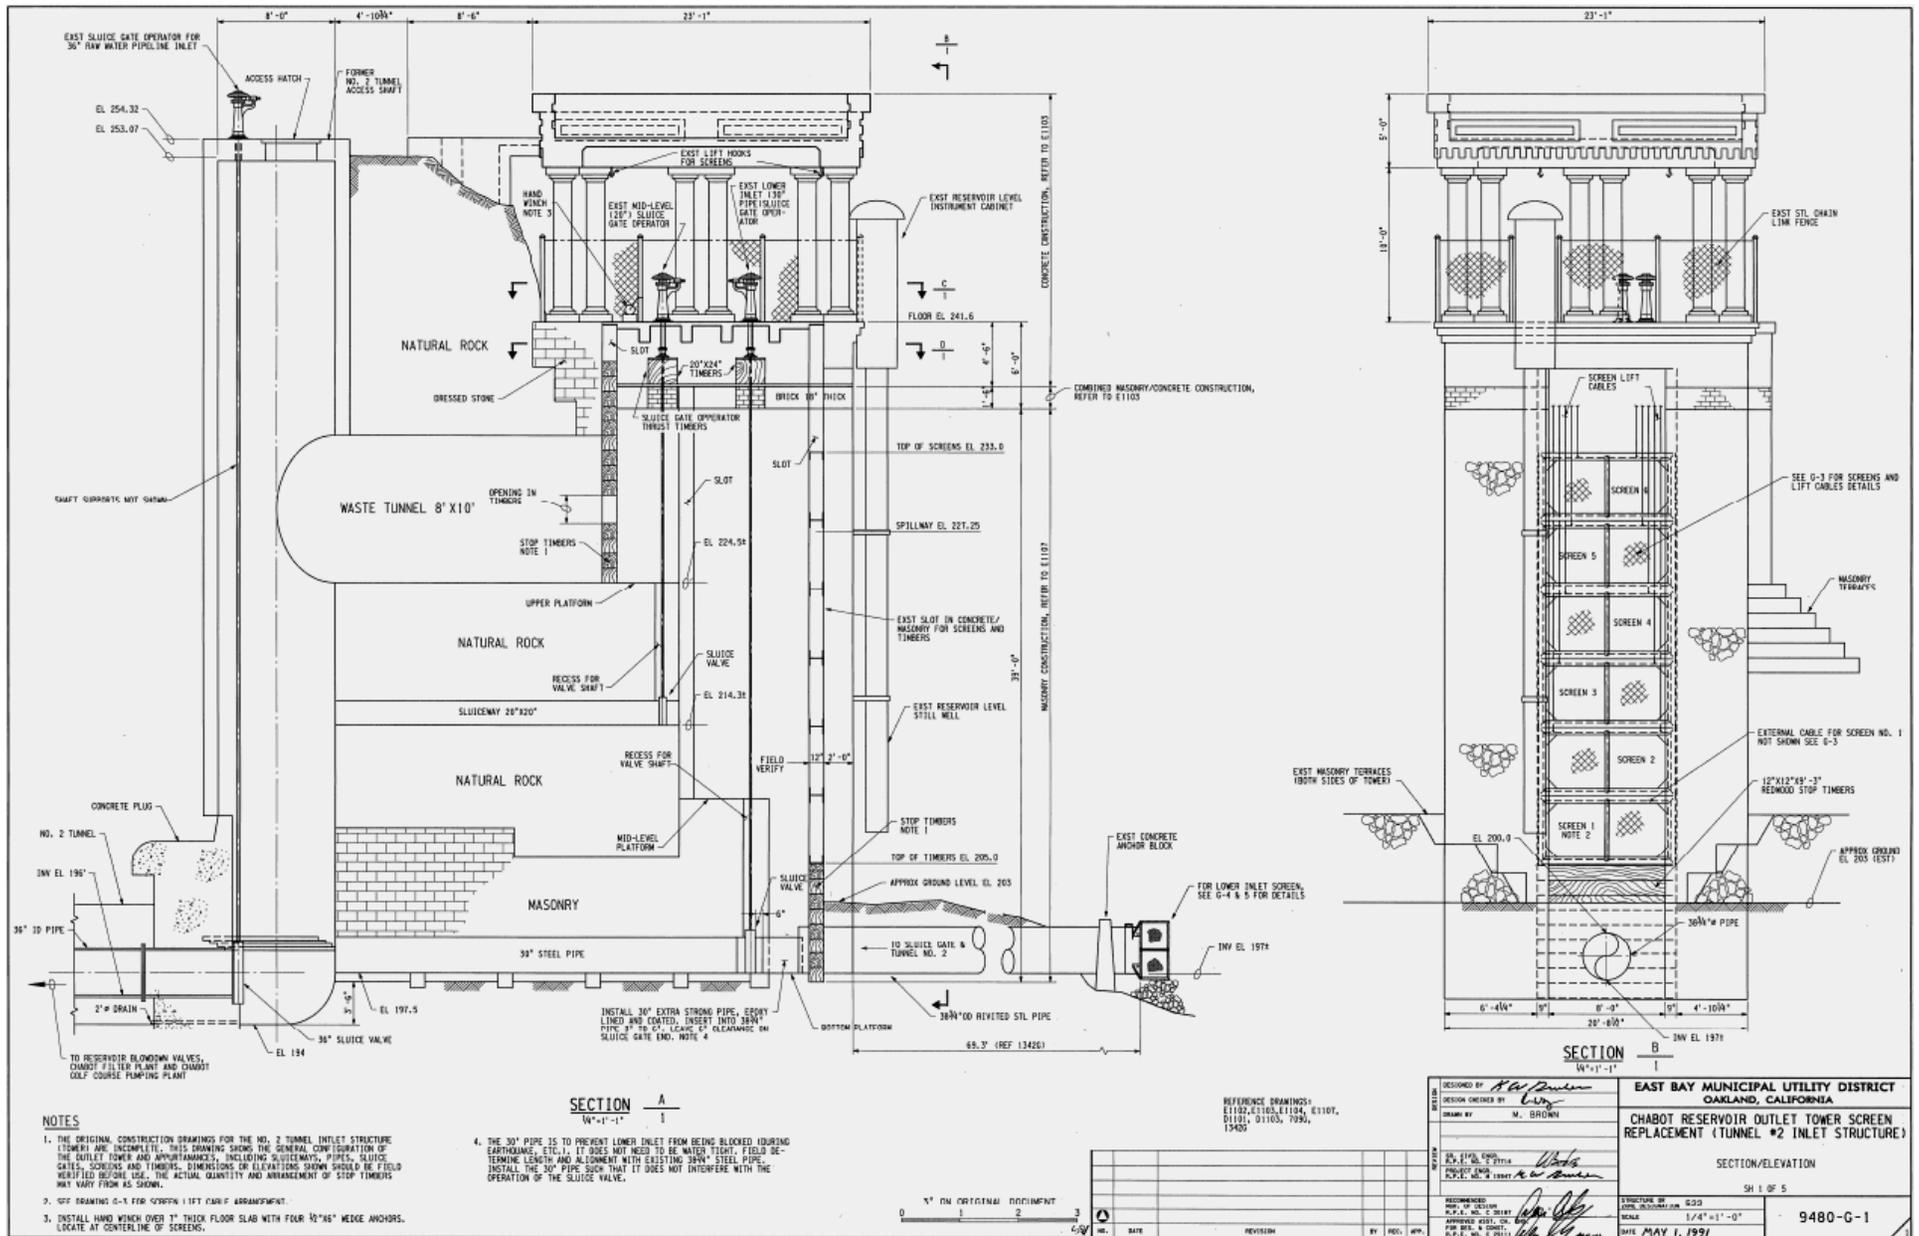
Section/elevation view showing multi-level entry portal structure and 8-foot brick-lined outlet shaft
